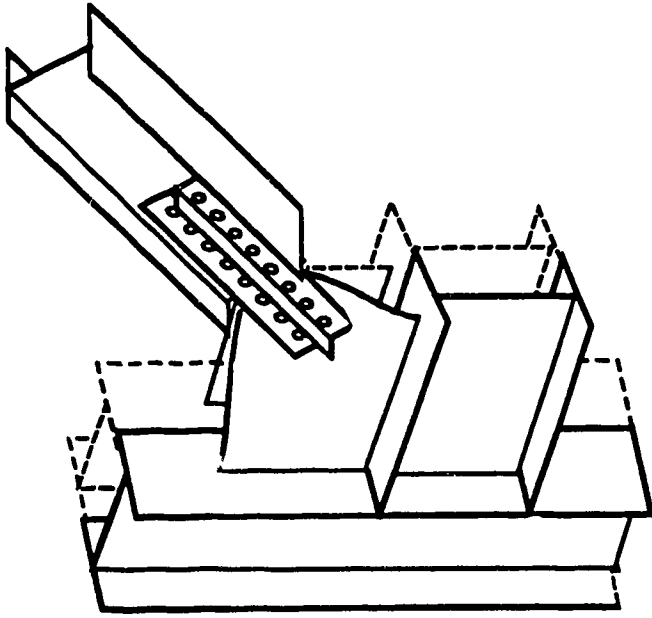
Splice Member Arrangement for EP Type Specimens
